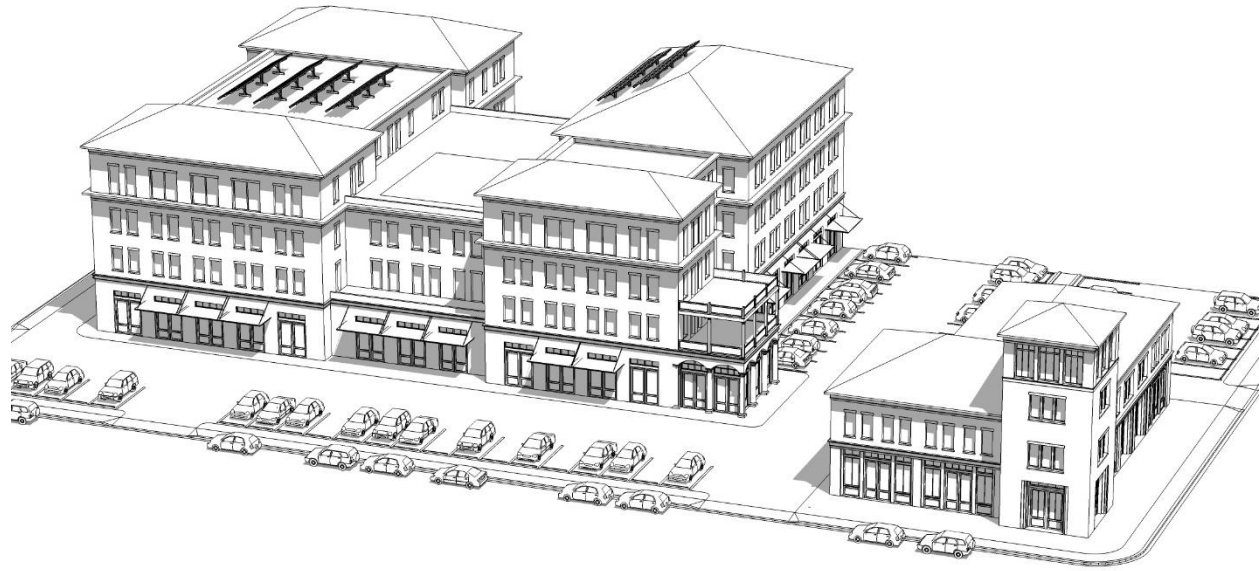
Transparency Requirements for Building Design Type D
